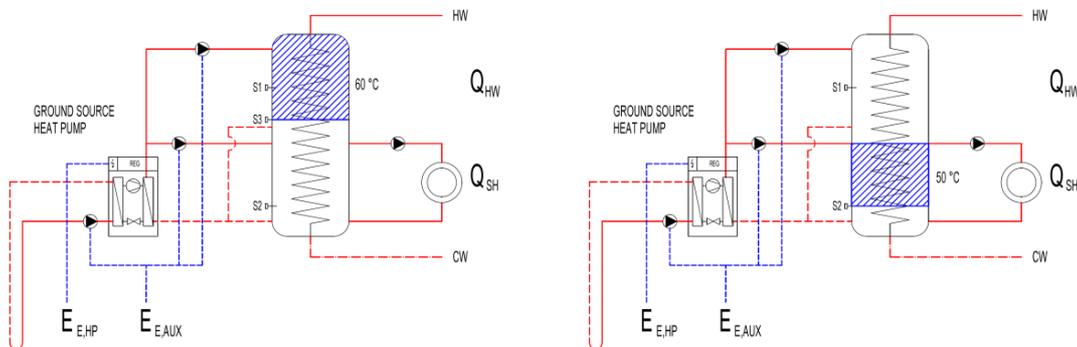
Alternatives of adaptive control for heat pump system: PV-HW (left) and PV-SH (right)
